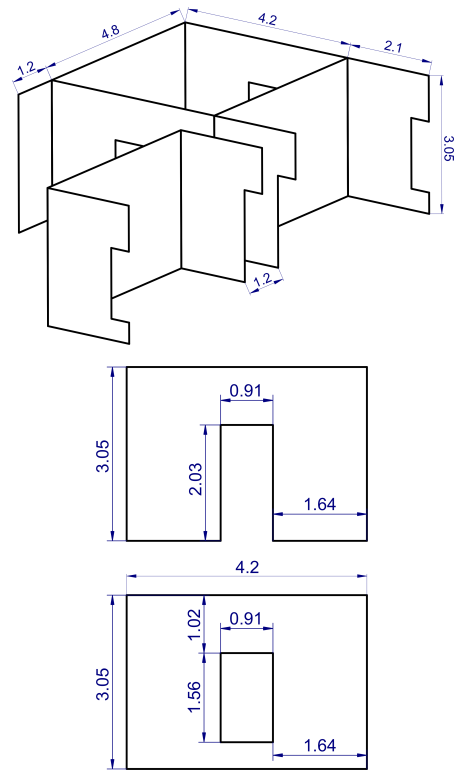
Detailed schematic of the considered room layout; all dimensions in meters; top: isometric view, middle: door dimensions, bottom: window dimensions.
